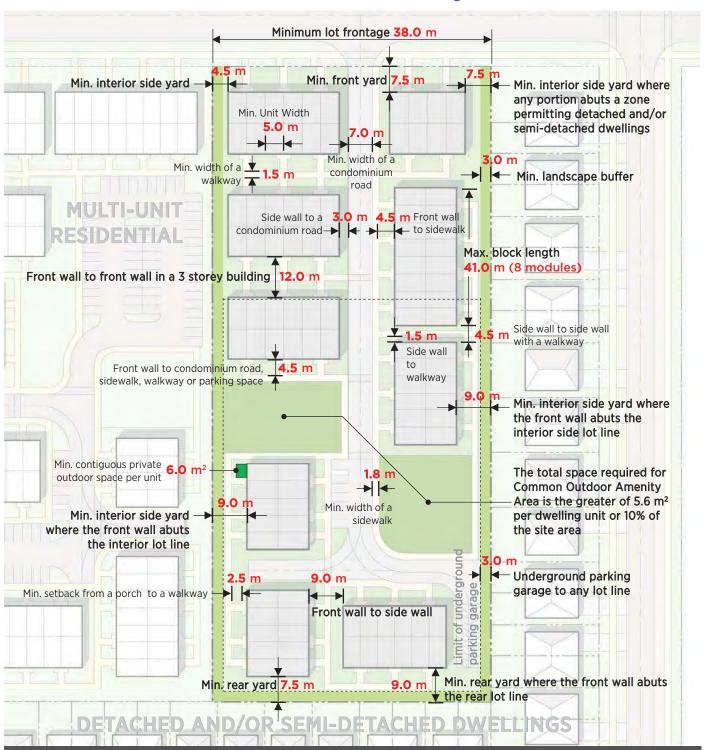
Standard Dimensions for Back to Back Townhouses (RM10). For Additional Standards refer to the Zoning By-Law.
